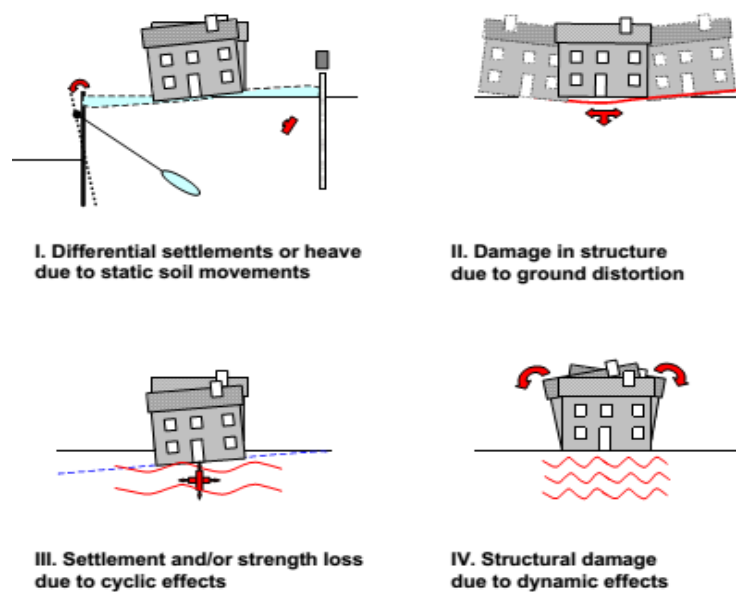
Damage mechanism due to pile driving of piles or sheet piles after (Massarsch 2000).
